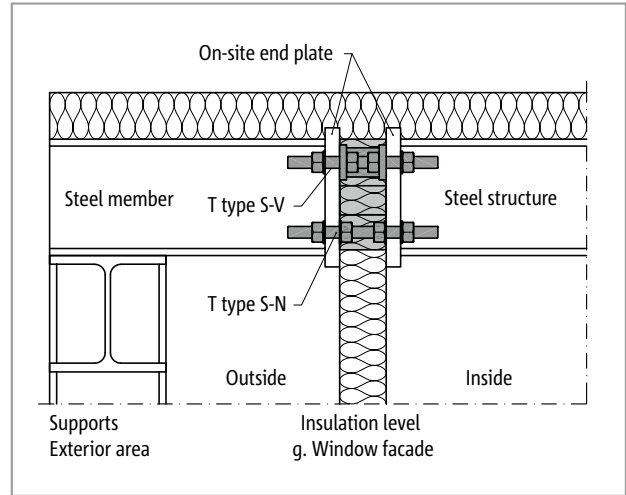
Schöck Isokorb® T type S for thermal separation within the structural system
